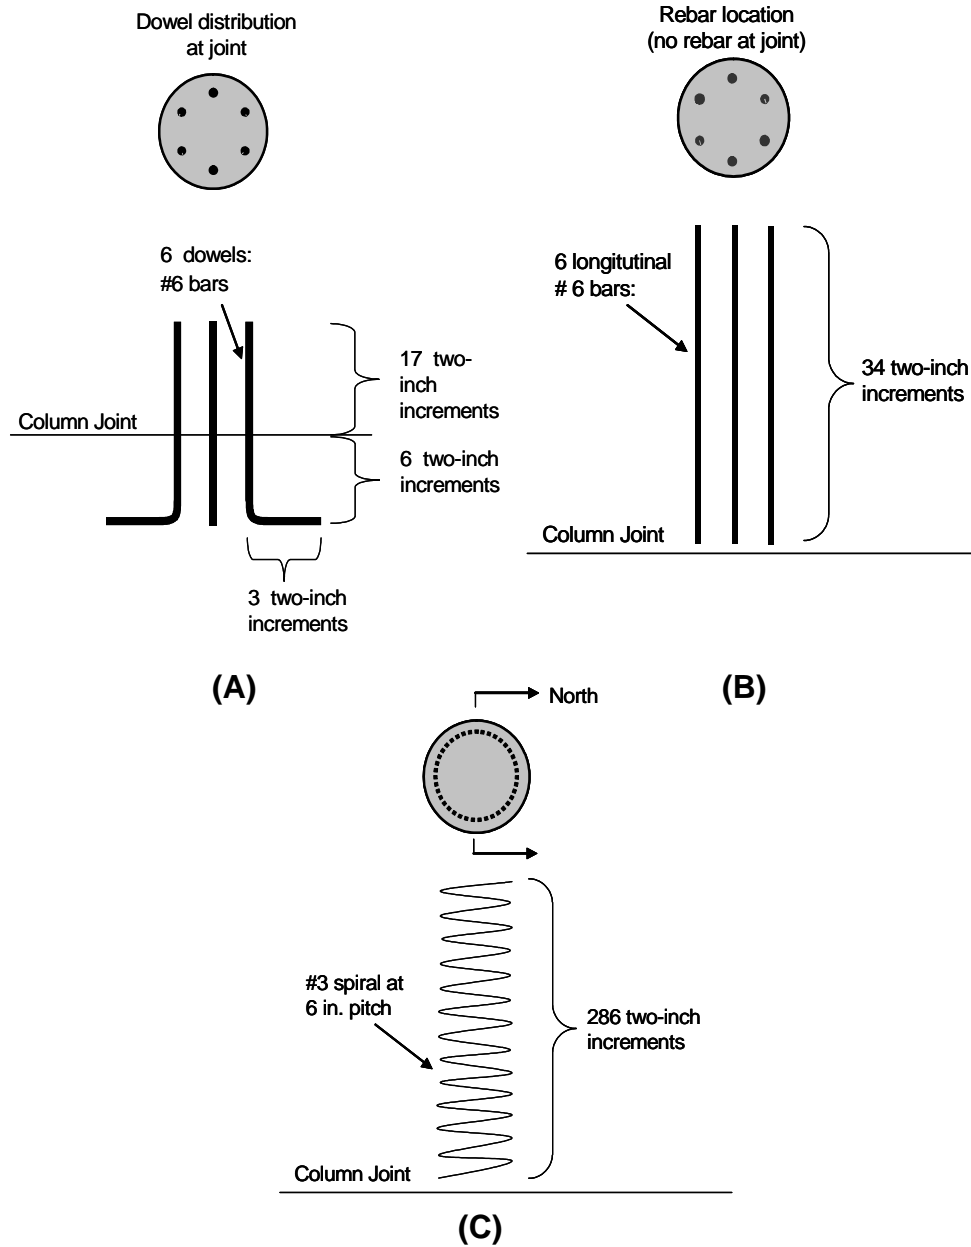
Concrete Removal and Reinforcement Dismantling<sup>1</sup>
